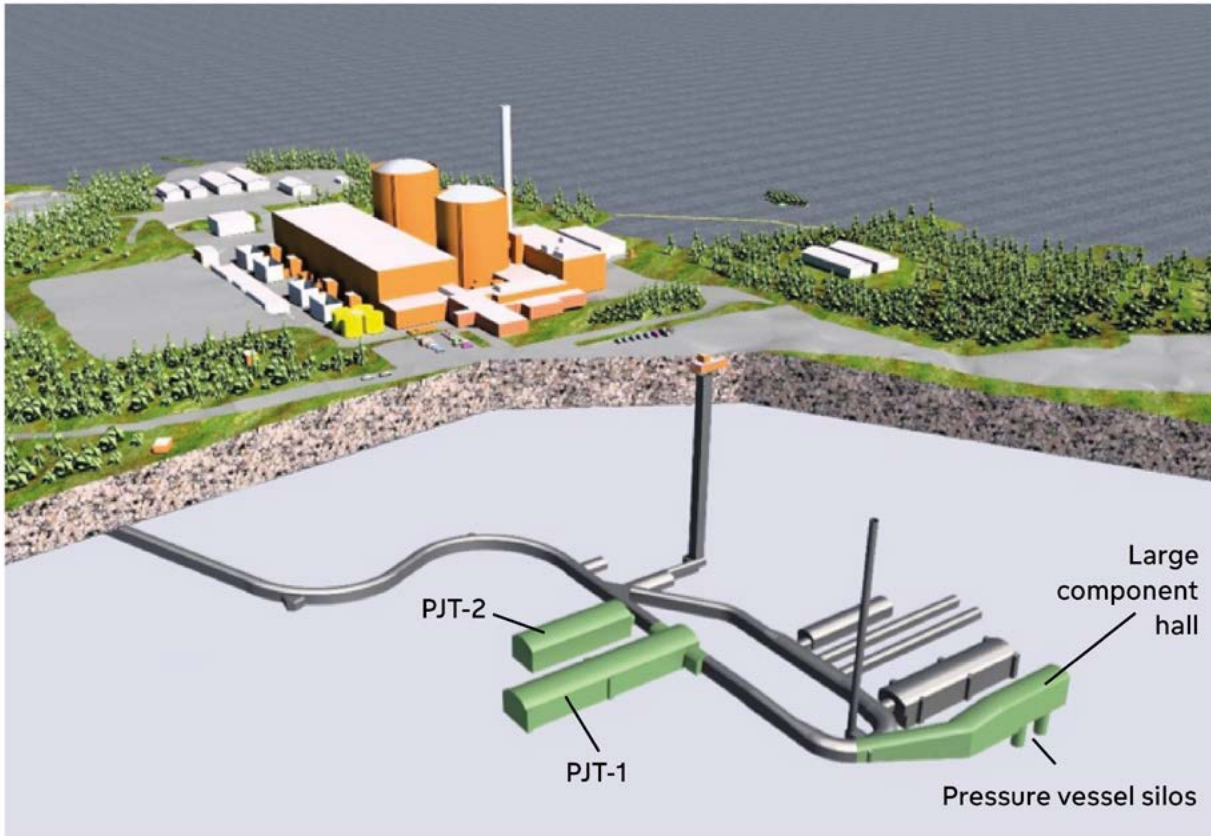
An illustration of the final disposal facility of Loviisa power plant for low and intermediate-level waste. In addition to the existing halls, the illustration shows the planned final disposal halls for decommissioning waste in green. In the illustration, PJT-1 and PJT-2 refer to halls 1 and 2 for dismantling waste.
